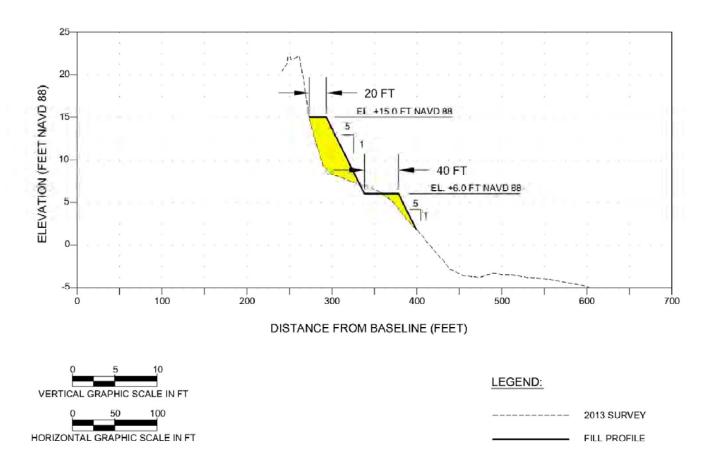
Typical beach design template for the Applicant's Preferred Alternative, depicting a 20-ft. wide dune at elevation +15.0 ft. NAVD 88 with a 40 ft. berm at +6.0 ft. NAVD 88
